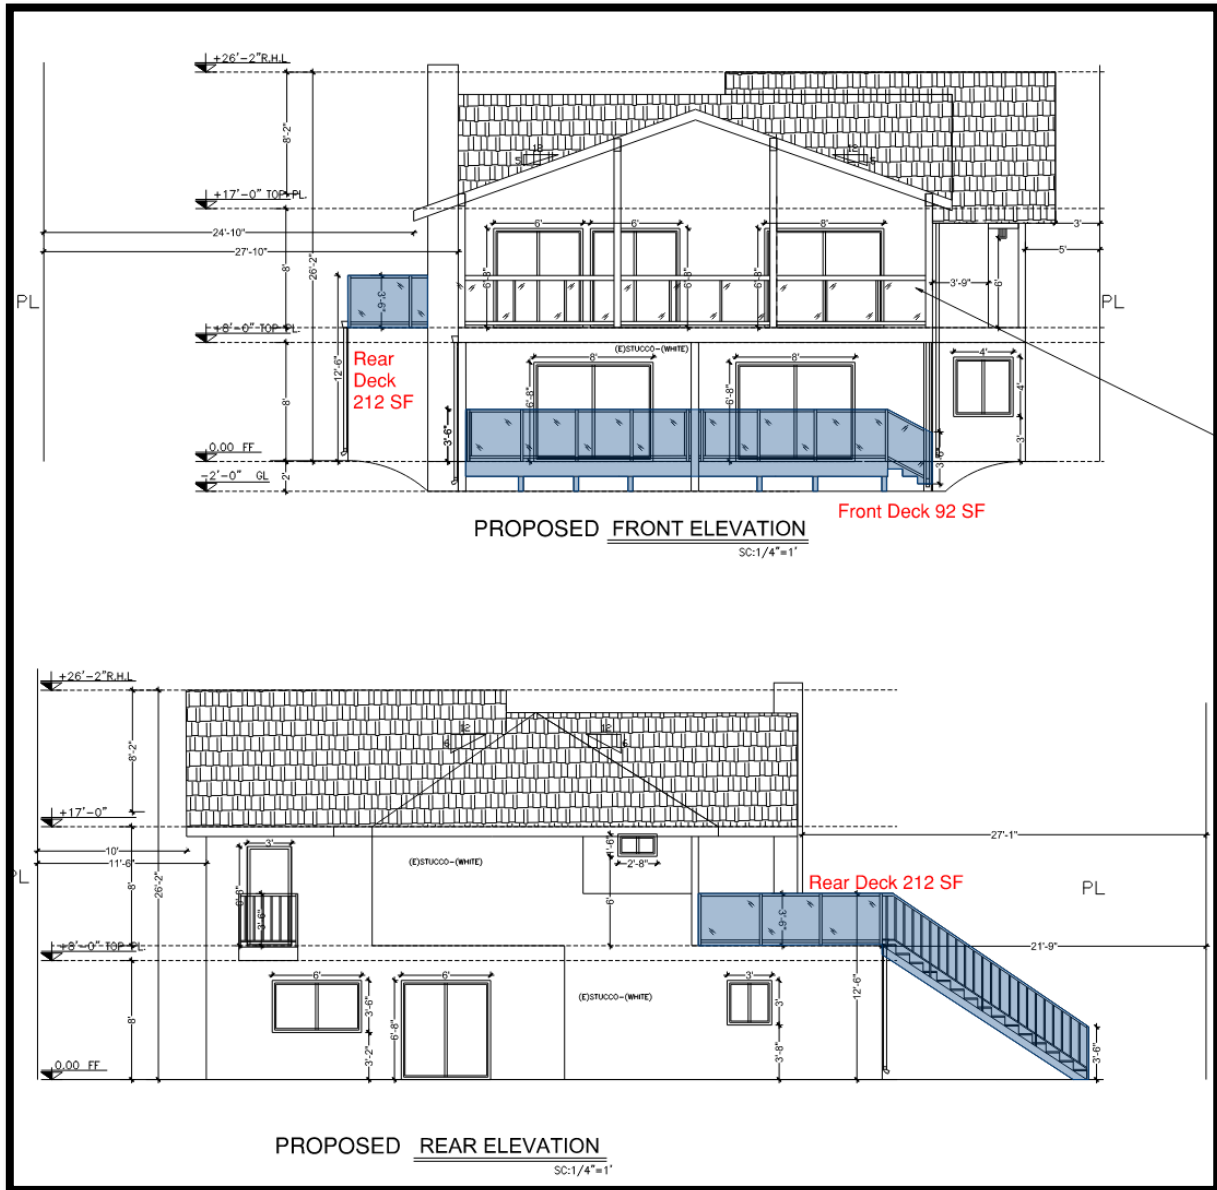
Elevation plan of the proposed development with additions shown in blue.
